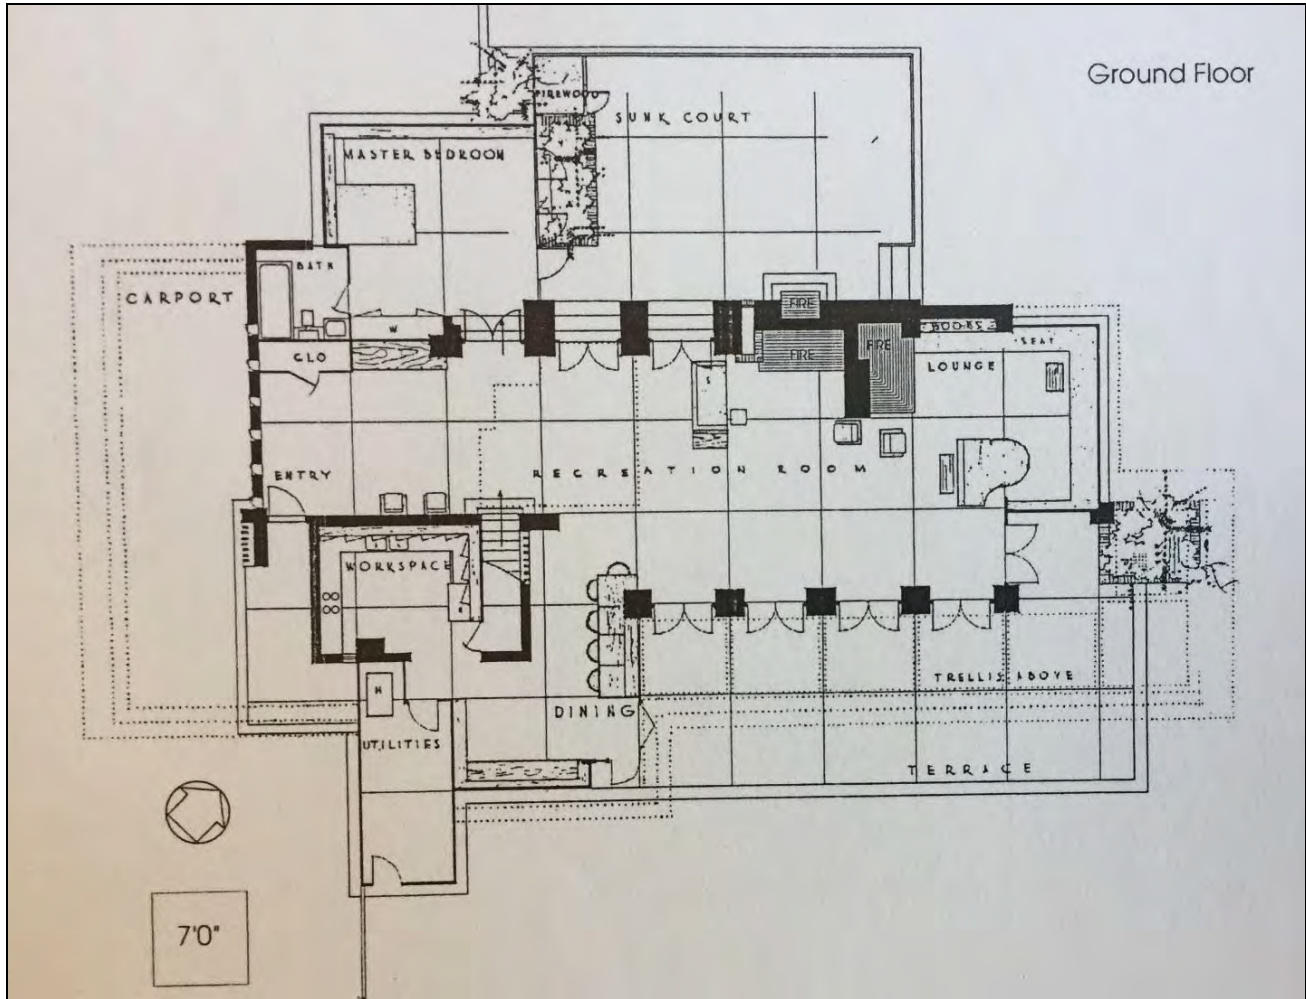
First Floor Plan, drawn by William Allin Storrer.
